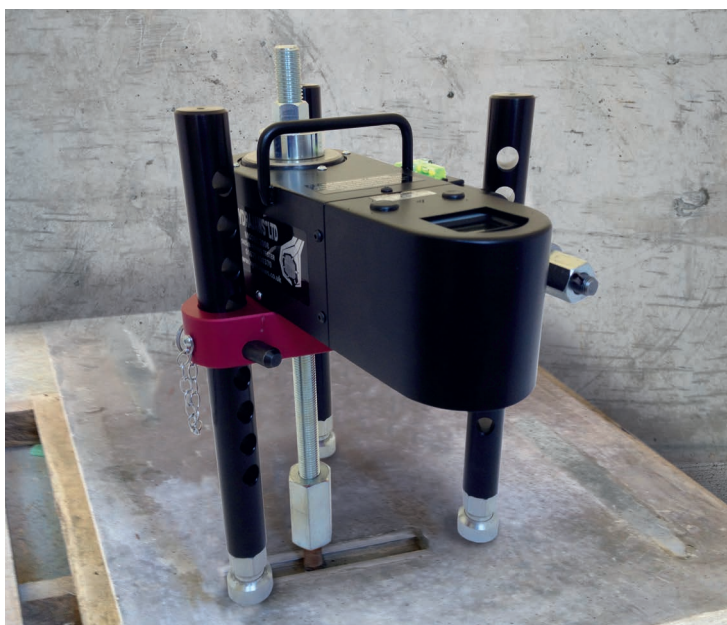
Arrangement to apply test load to a fixing (courtesy Hydrajaws)
